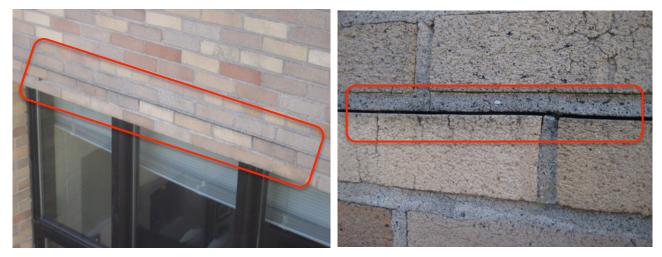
Horiz. Crack @ Sagging Lintel Fig. 3.64: Horiz. Crack @ Sagging Lintel
